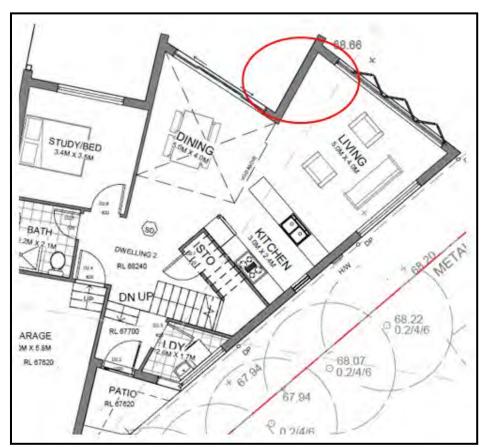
Living area within Dwelling 2 – potential for north facing window circled in red
